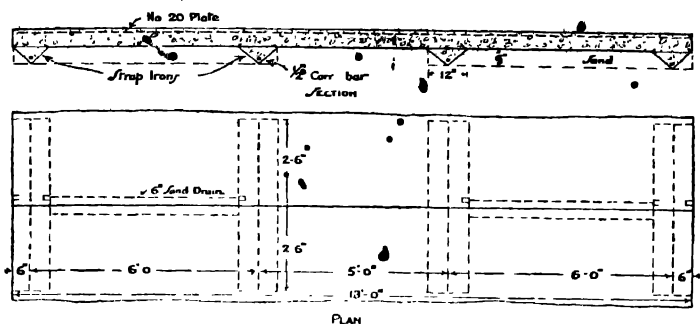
Method of Strengthening Transverse Joints by Longitudinal V-shaped Reinforced Beams.
